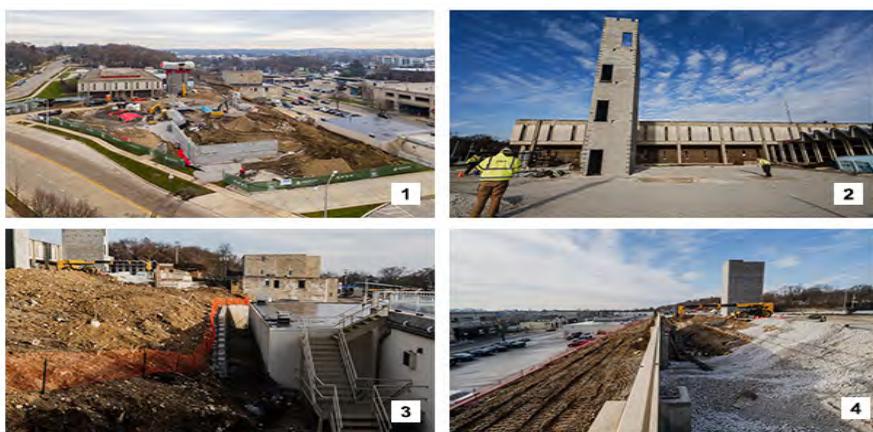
Aerial looking southwest with Delafield St. to the north and E. North Ave. to the south (2) West stair tower constructed within 15 feet of the existing City Hall to the north (3) Southeast corner of the site looking west along the double-bearing wall to allow for construction of the skywalk that will run across E. North Ave. and connect to an existing parking structure (4) Southwest corner of the site looking along building foundation walls
